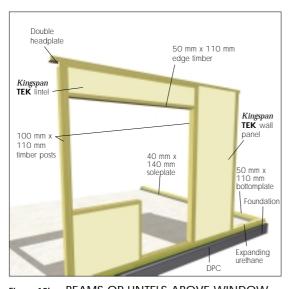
BEAMS OR LINTELS ABOVE WINDOW AND DOOR OPENINGS – CROSS SECTION
